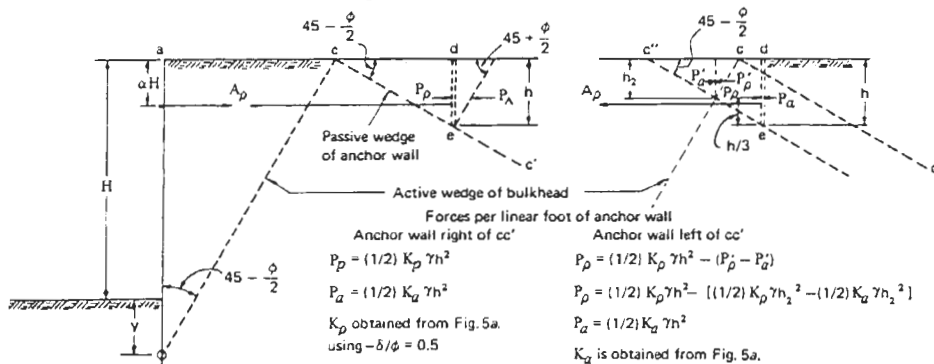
Continuous anchor wall (after Navdocks¹¹)
